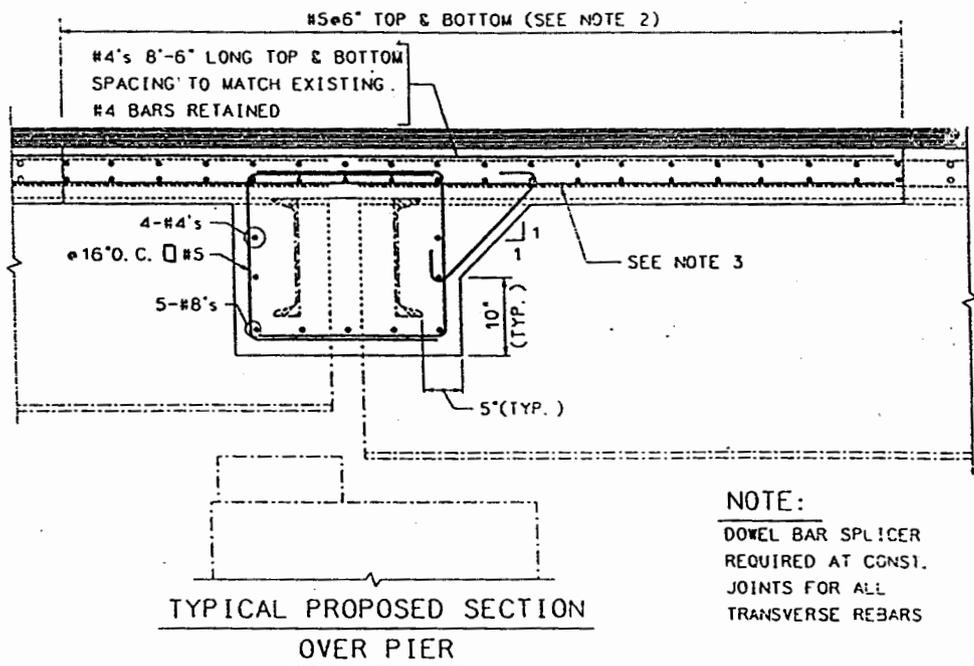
Concrete Encasement Connection: Massachusetts
